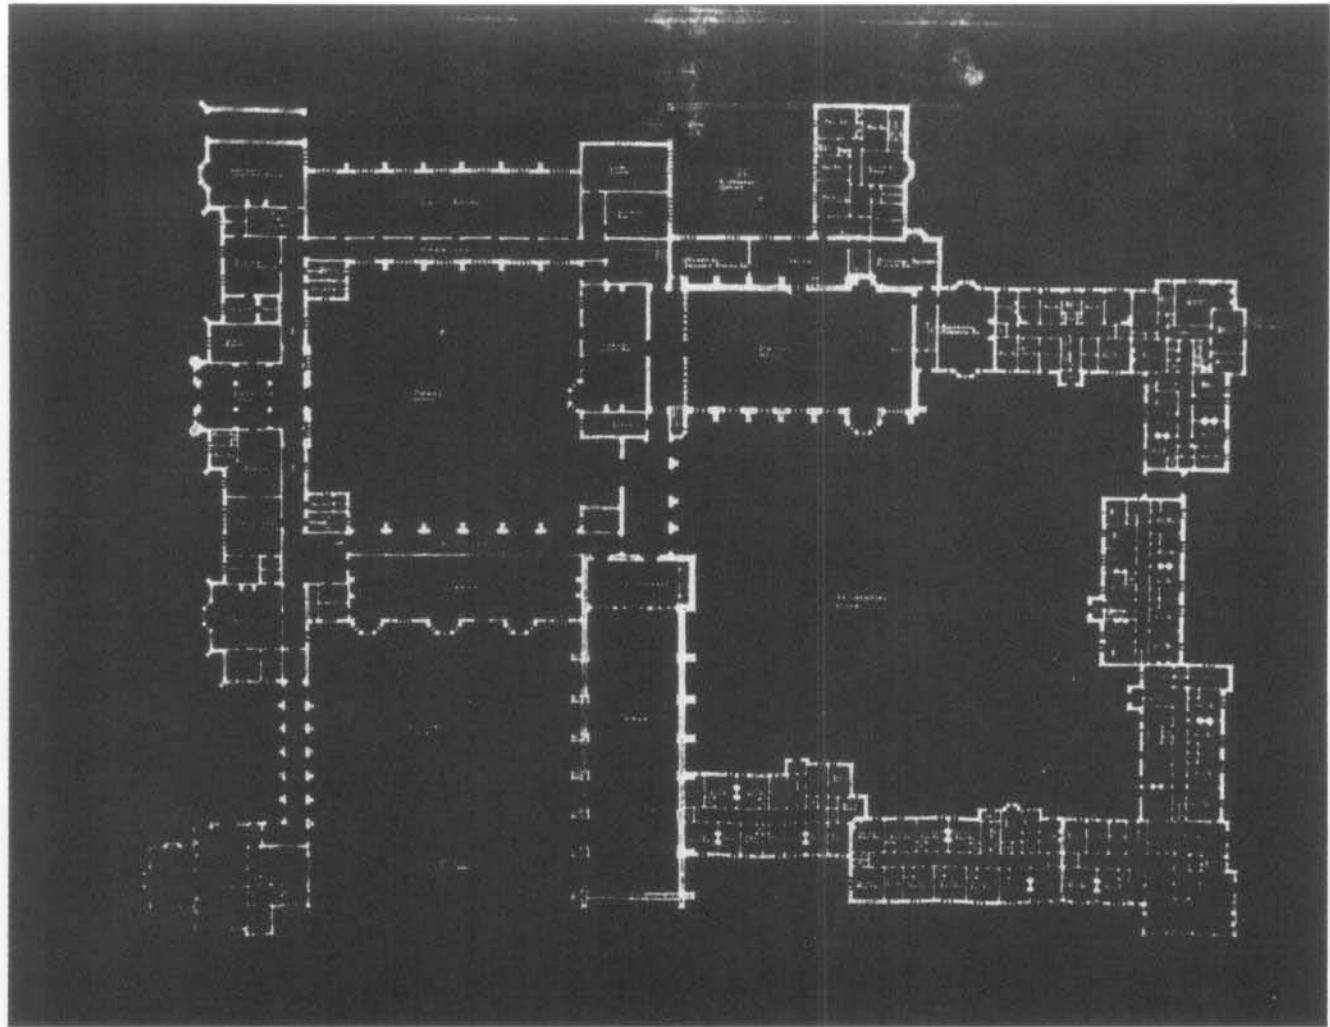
DARLING & PEARSON, Proposal for Trinity College, Hoskin Ave., Toronto, ground floor plan, March 1914.
